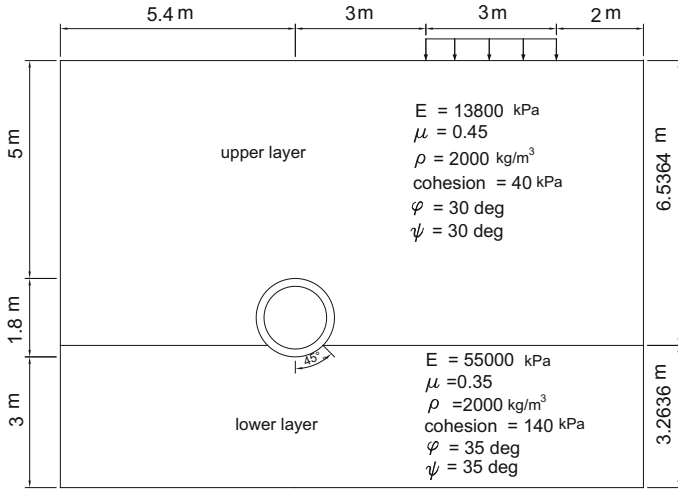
Embedded culvert subject to gravity and unsymmetrical surcharge
